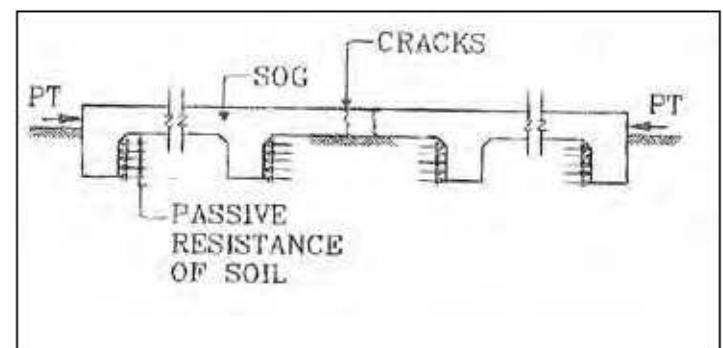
Cracks arising from resistance of ground to prestressing of ground slab
